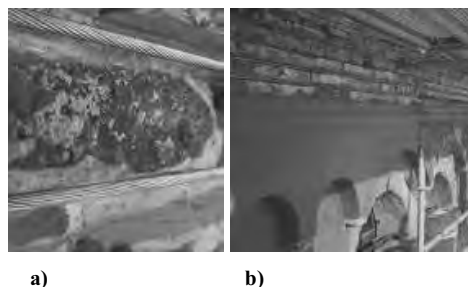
External confining stainless steel cables, Clock Tower, Padua: a) detail of the cable insertion between the mortar joints; b) view of the positioned cables, façade.
